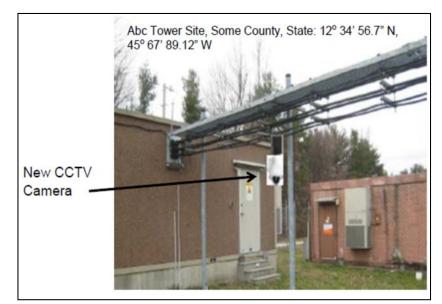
Ground-level photograph with graphic showing proposed equipment installation.
